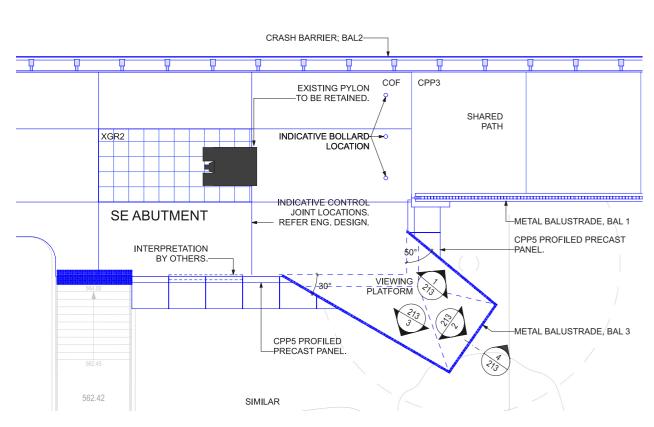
SE Abutment and Lookout Plan (Scale 1:150)
